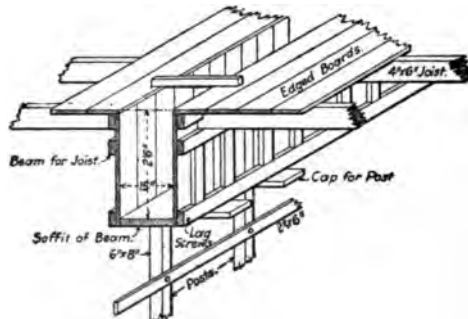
Slab and Girder Floor Mold, Central Felt and Paper Co.'s Factory.
